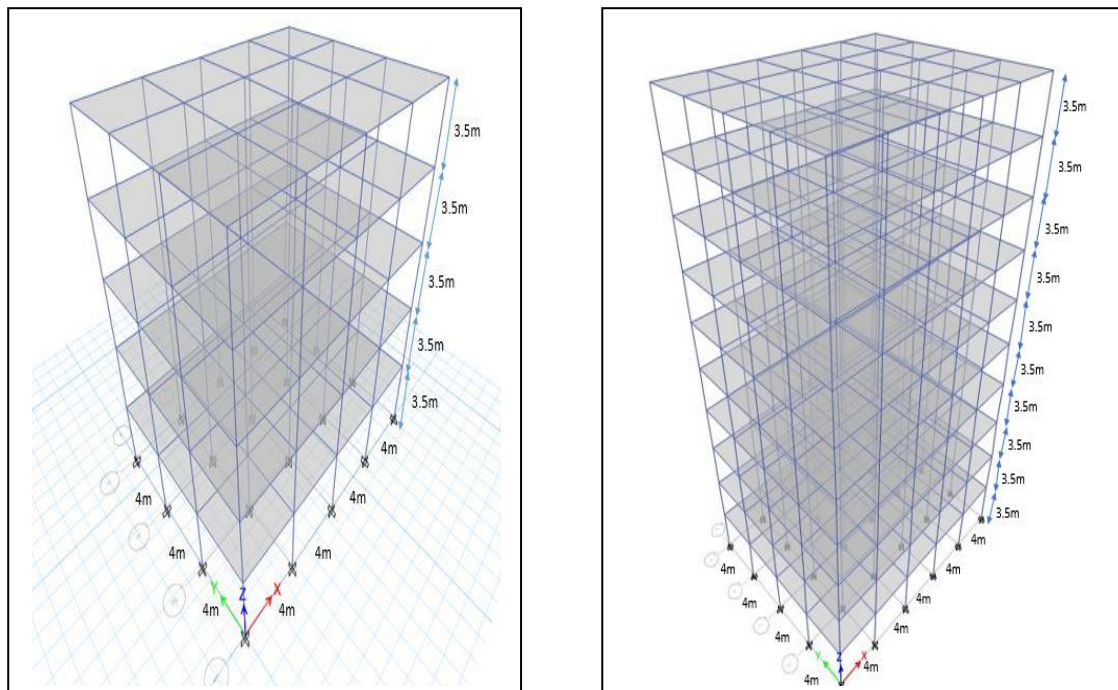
Typical 5 storey buildings layout Fig.3: Typical 10 storey buildings layout
